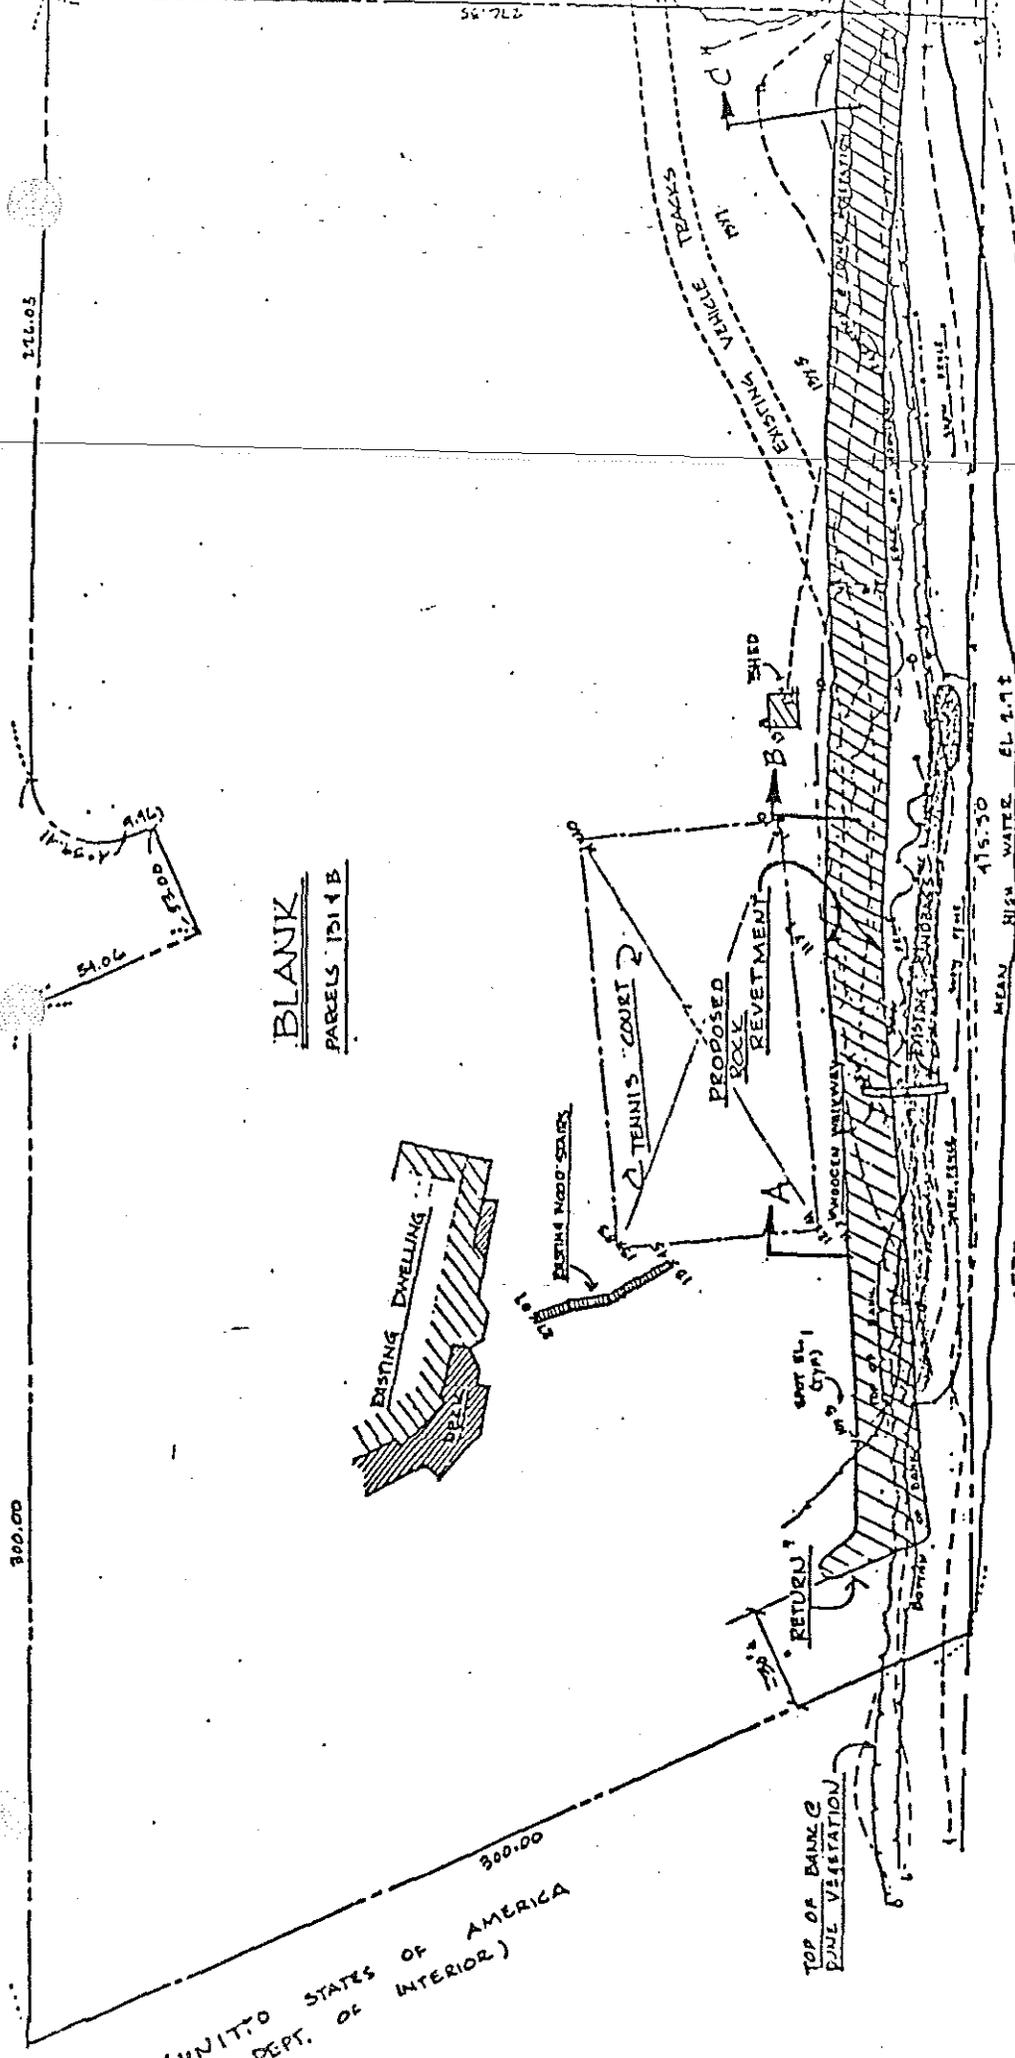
B: PLAN OF PROPOSED REVETMENT ON BRONTAS PROPERTY
